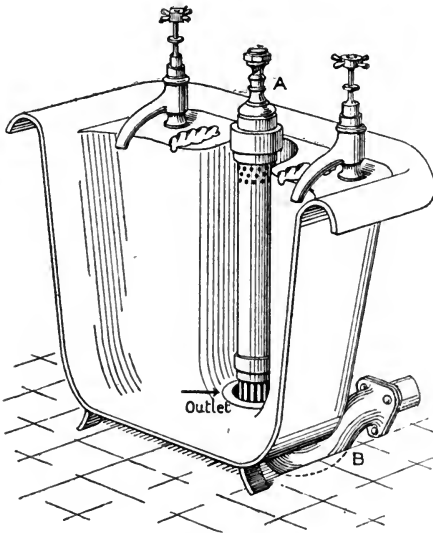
Head of bath. The plug A can be completely removed to allow of access to the trap B.
